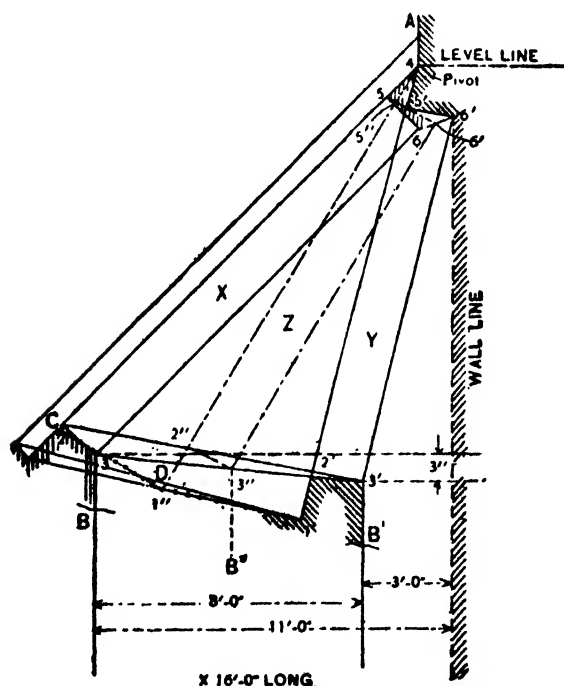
Obtaining Profiles for Top Ridge and Bottom Curb
